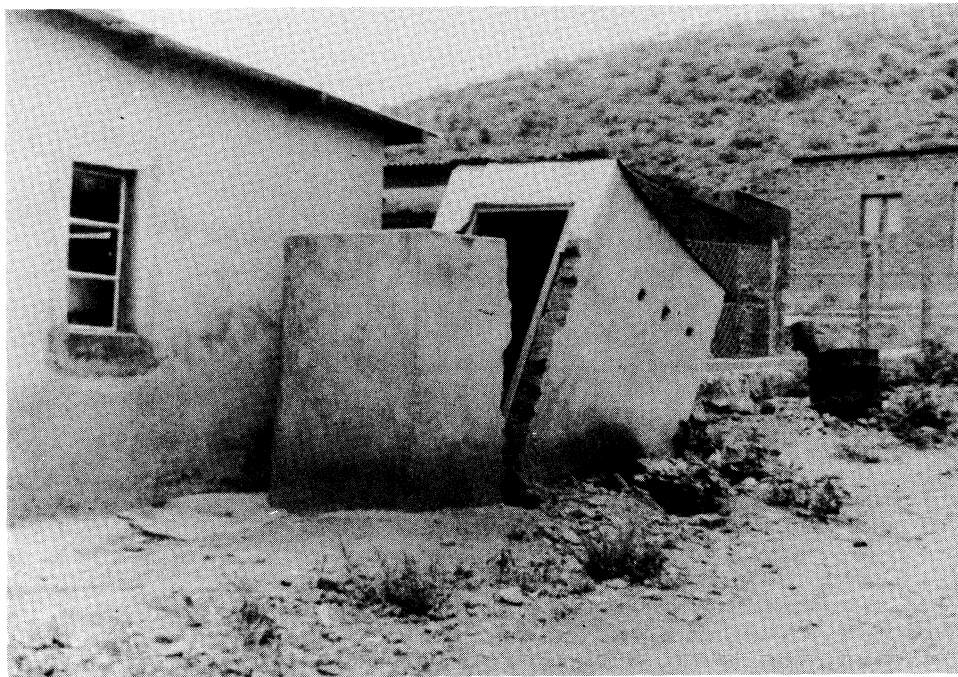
A collapsed pit latrine. The superstructure is unnecessarily massive and was placed on inadequate foundations above an unsupported pit. Figure 16 shows a more correct design to prevent the collapse of pit latrines. (Photo: R. G. Feachem).
